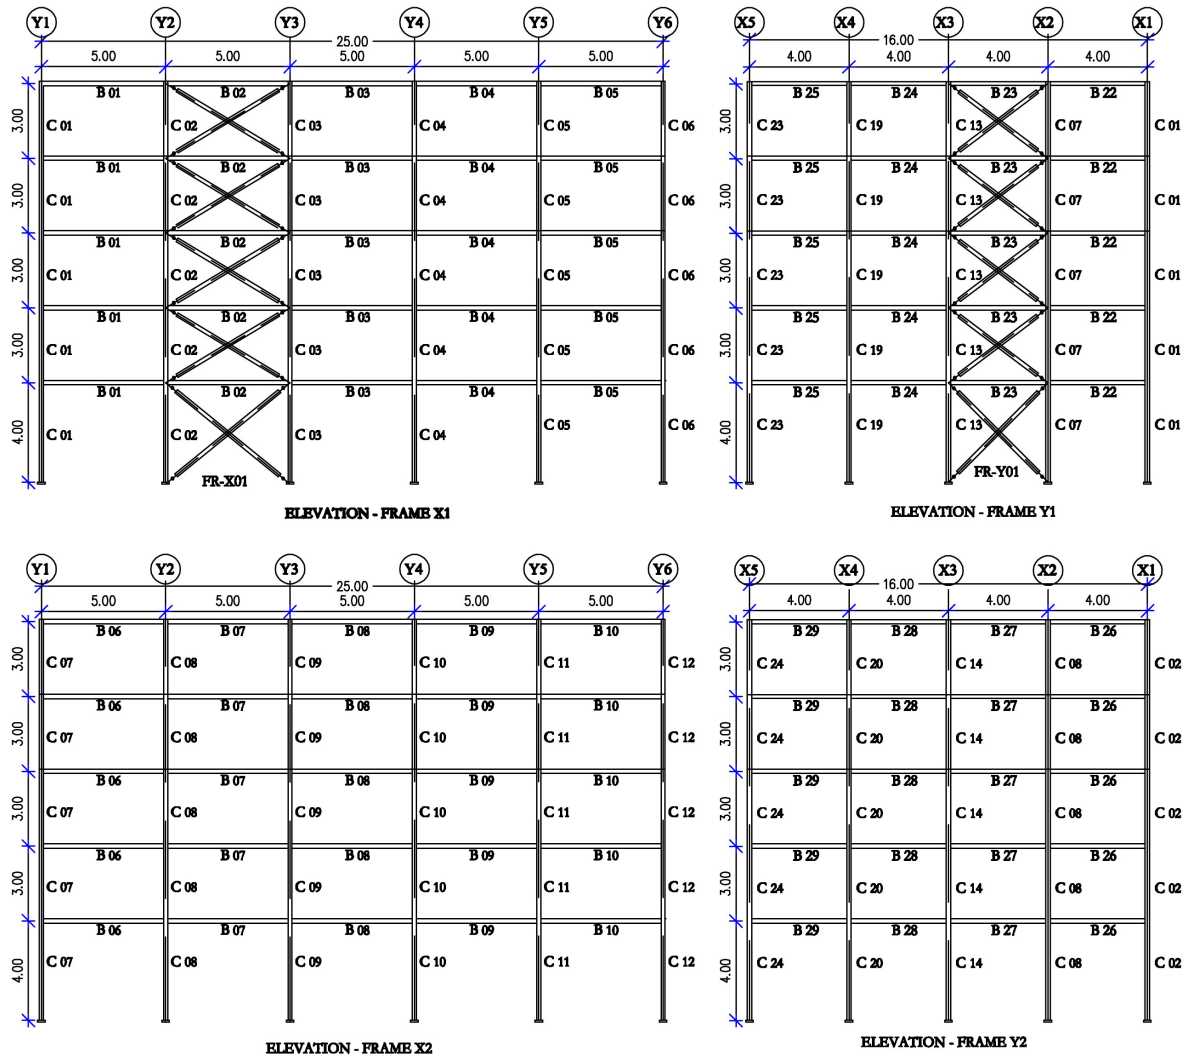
Elevations in X and Y directions of the 5-story torsionally stiff and flexible steel buildings.
